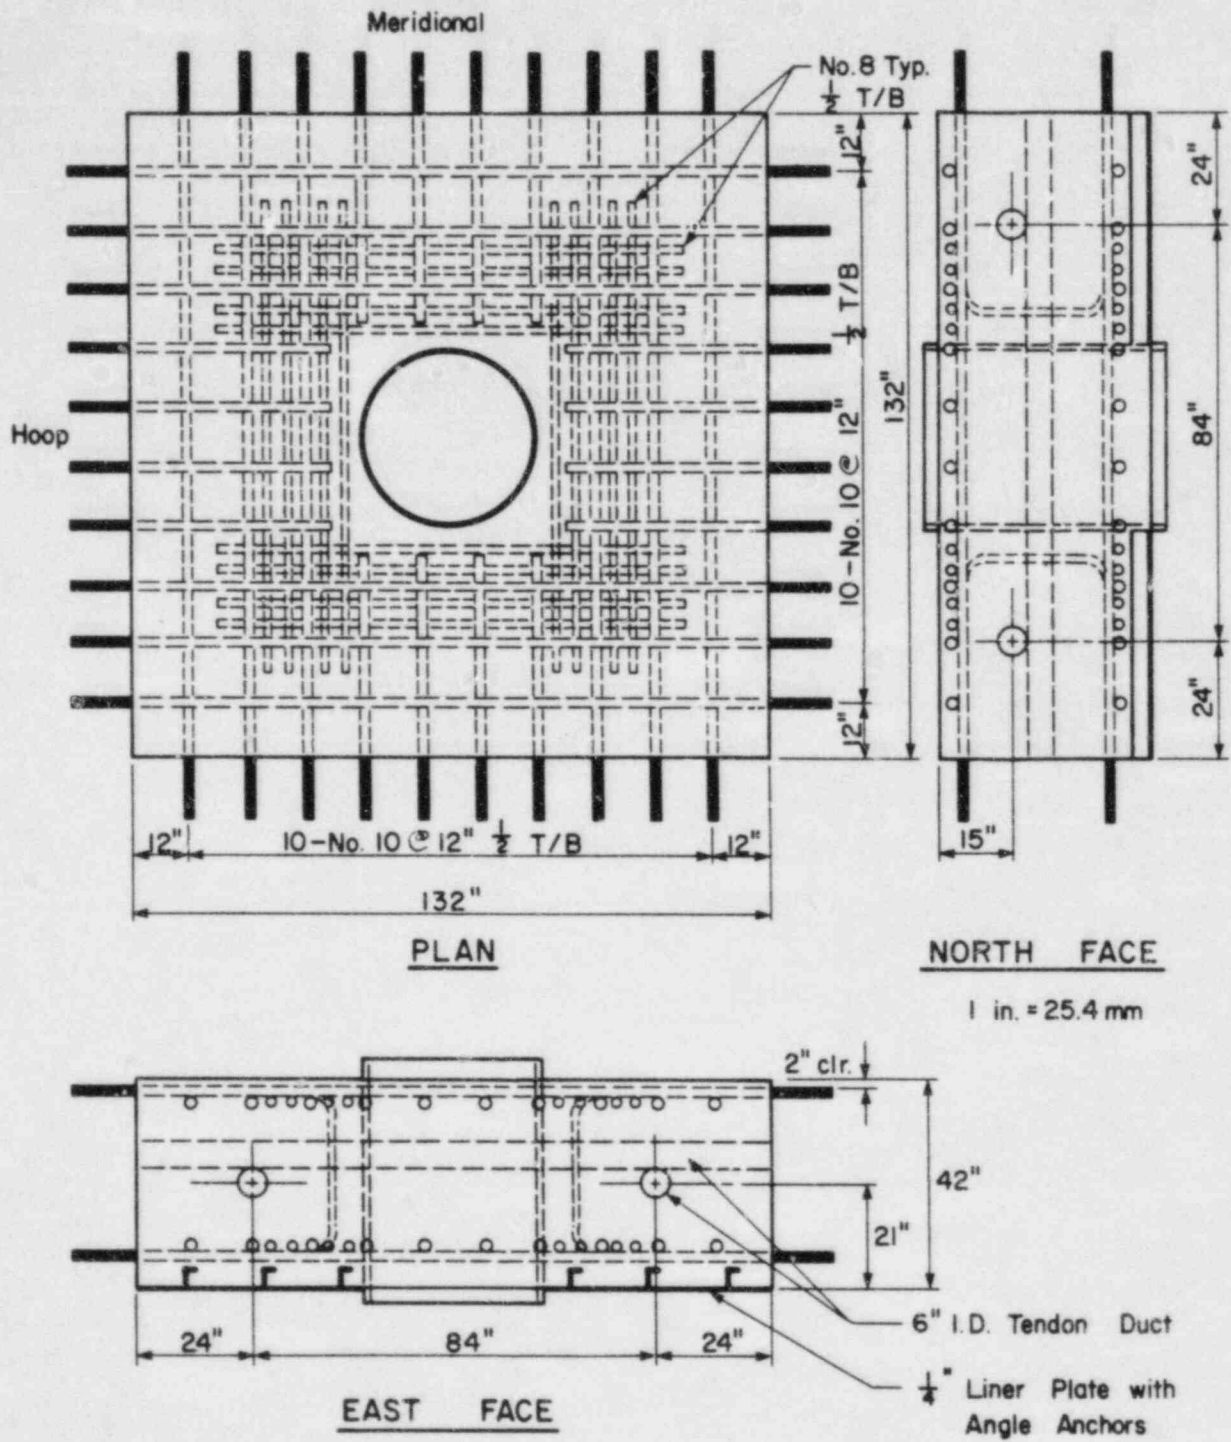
Reinforcement Details For Phase 2 Specimen 4
